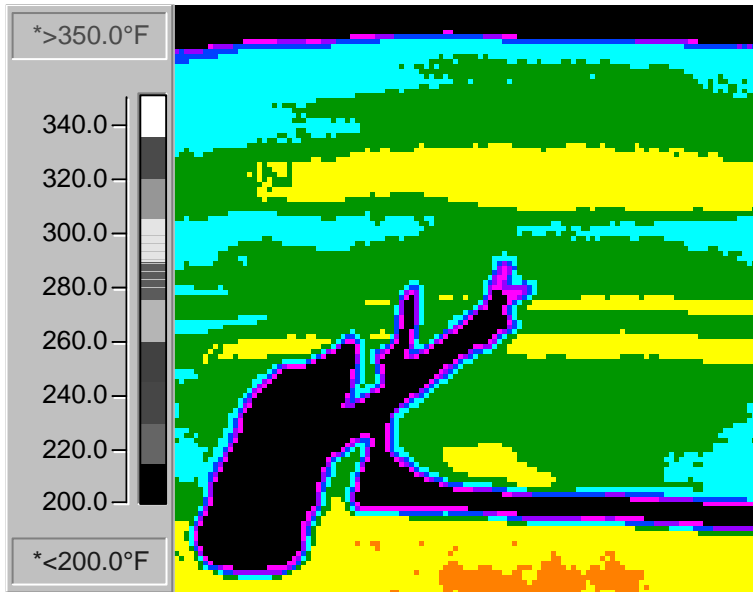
IR Image at 620 Feet into US 79 Test Section.
